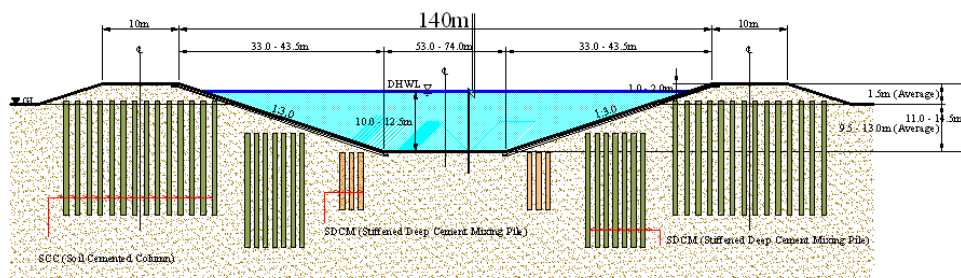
Channel Cross Section of Ayutthaya Bypass Channel (Capacity: 1,400 m³/s)
